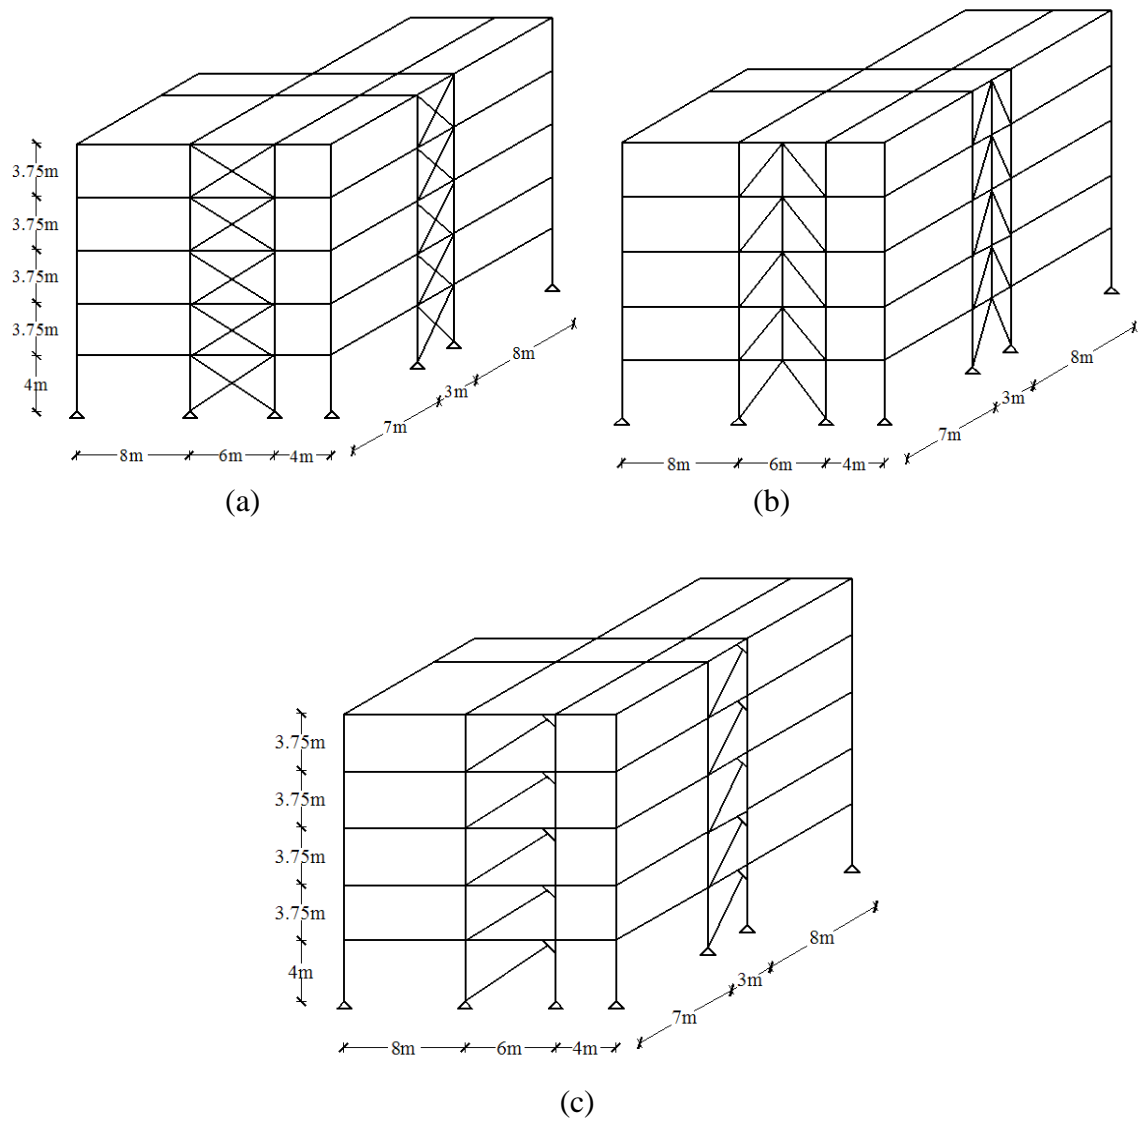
Asymmetrical Plan and Symmetrical Section central bays (a) cross (b) zipper (c) knee bracings.
